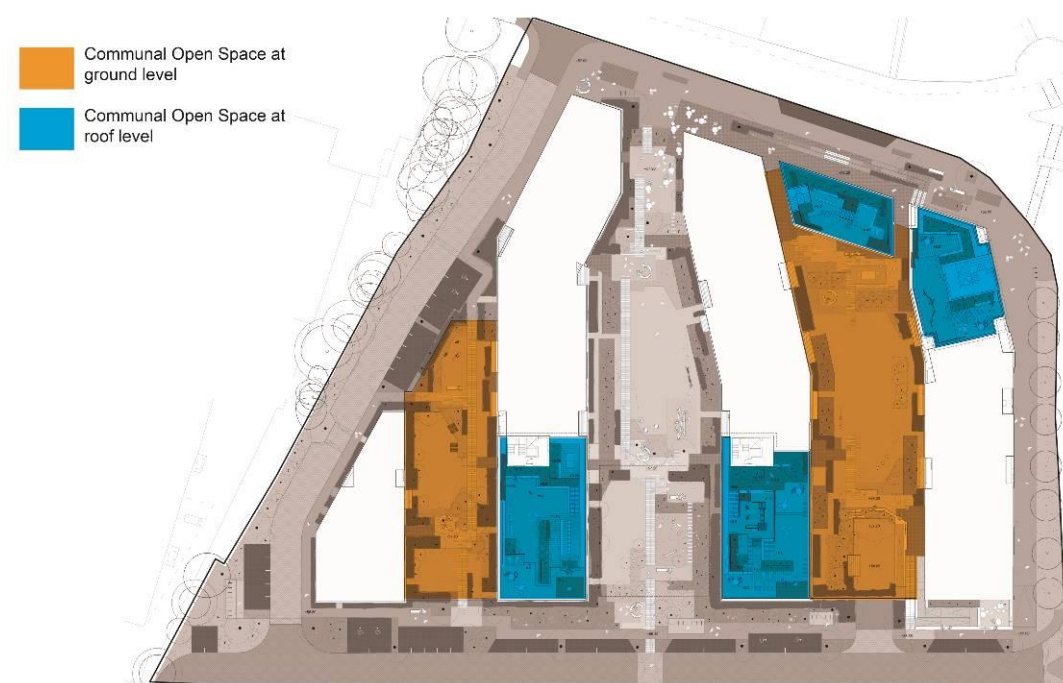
Diagram of the subject site highlighting communal open space at ground (pink) and roof level (blue).
